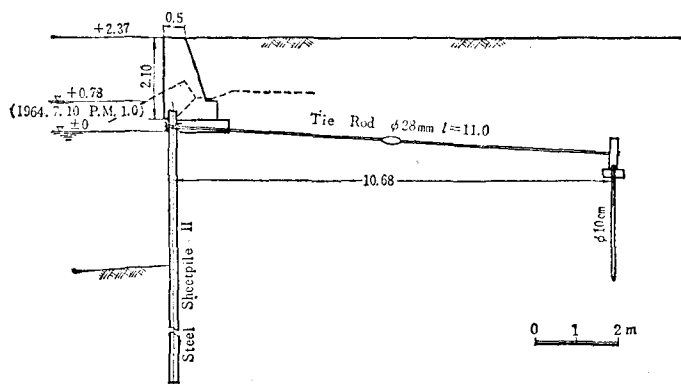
Cross Section of Sheetpile Bulkhead in Yamanoshita Revetment in Niigata Port
